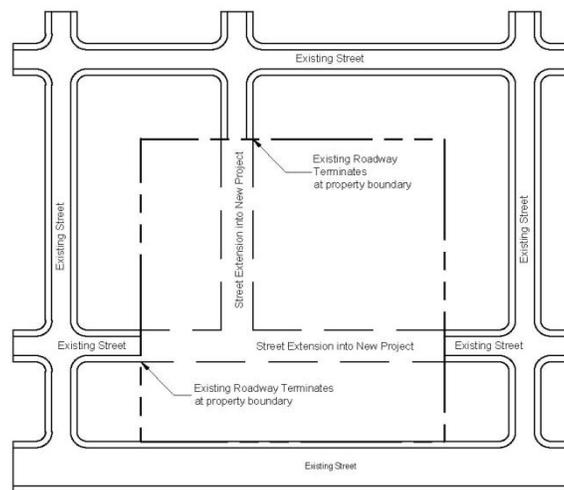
(a).1 – Site Layout – Street Extensions into New Projects/Developments
